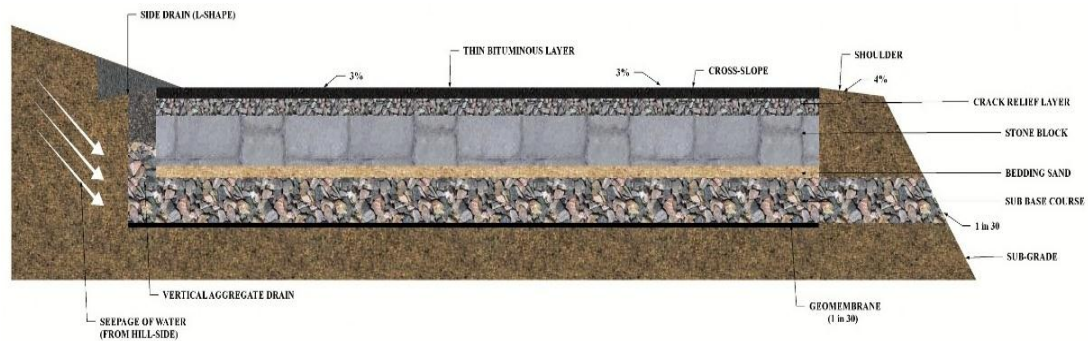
Typical cross section of low traffic volume road for weak rock, high water table and seepage from the hillside
